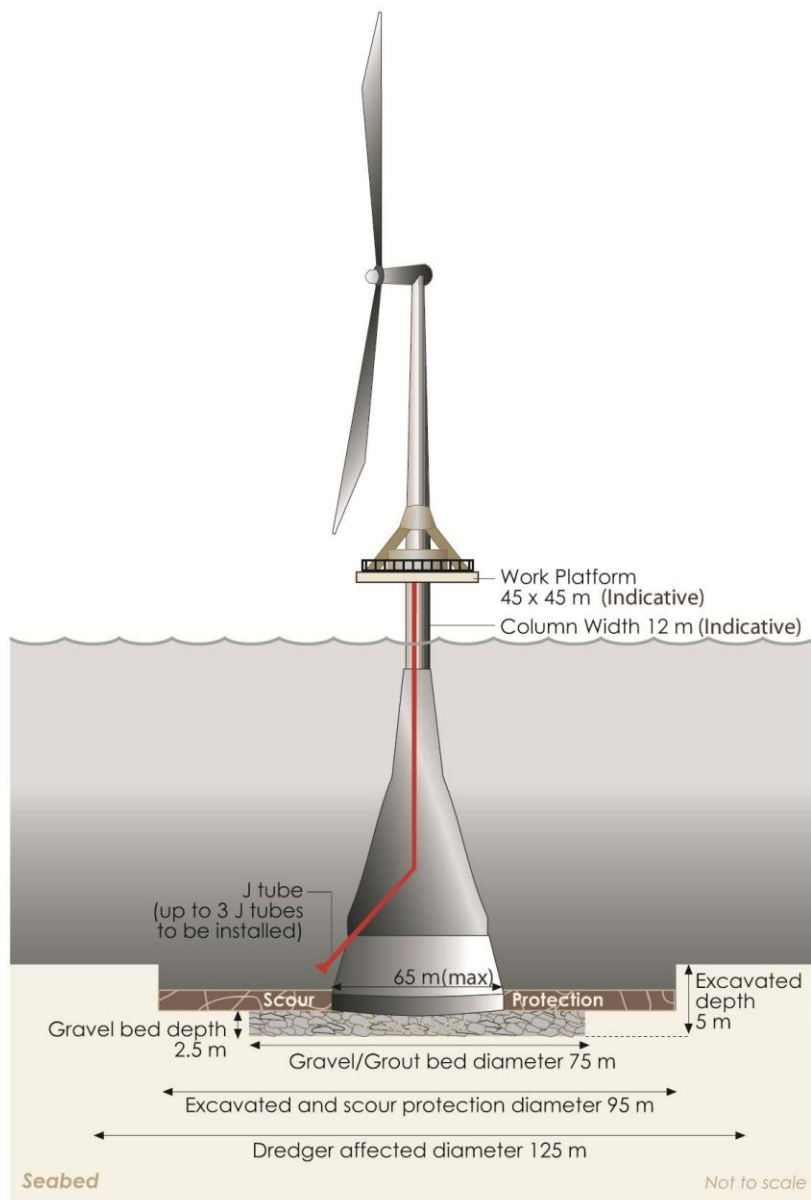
Diagram of a Typical GBS Substructure and Gravel Bed Foundation
